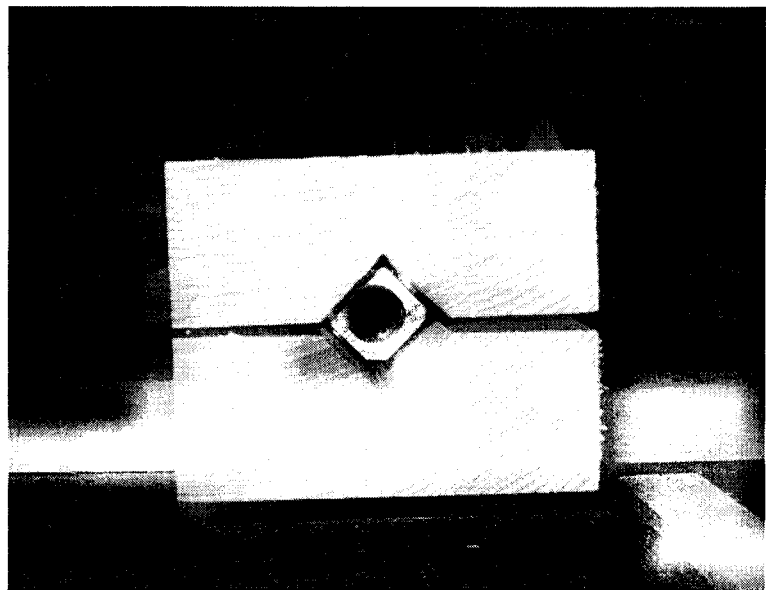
Embedded connector; beam ready to be pressed in hydraulic press
